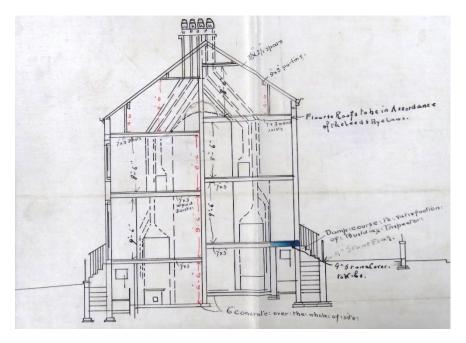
Section showing the chimney flues and basement set-pot (Carby Hall and Dalby 1903). Being one of the later houses to be built in the neighbourhood, there was a requirement for a damp proof course (as noted on the drawing).
